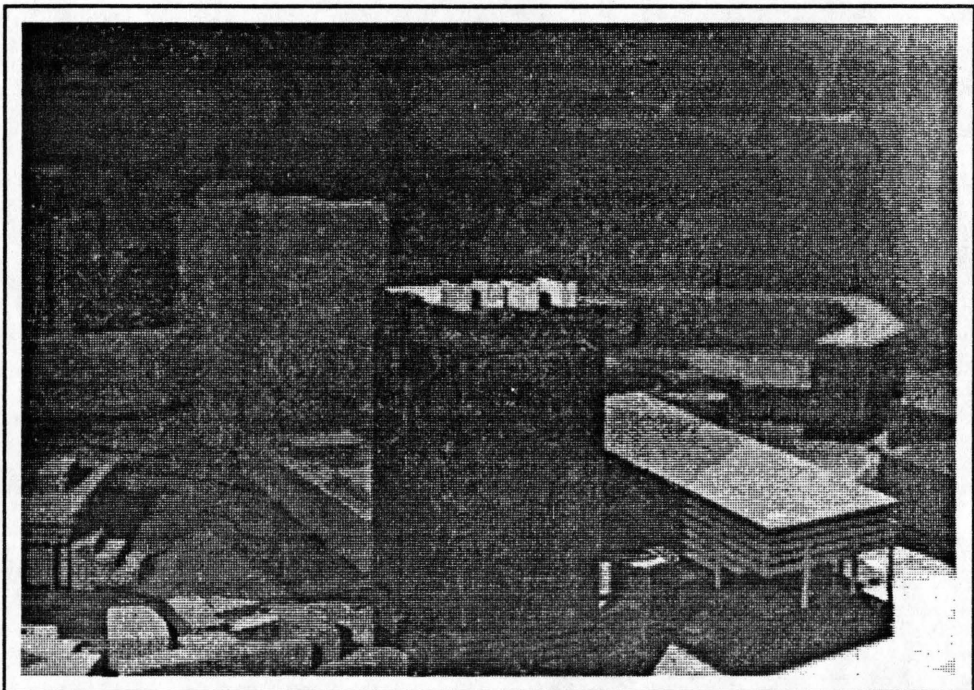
Parcel 7 Vent Building Model : 375 foot building, 42 foot garage and 400 foot stacks
